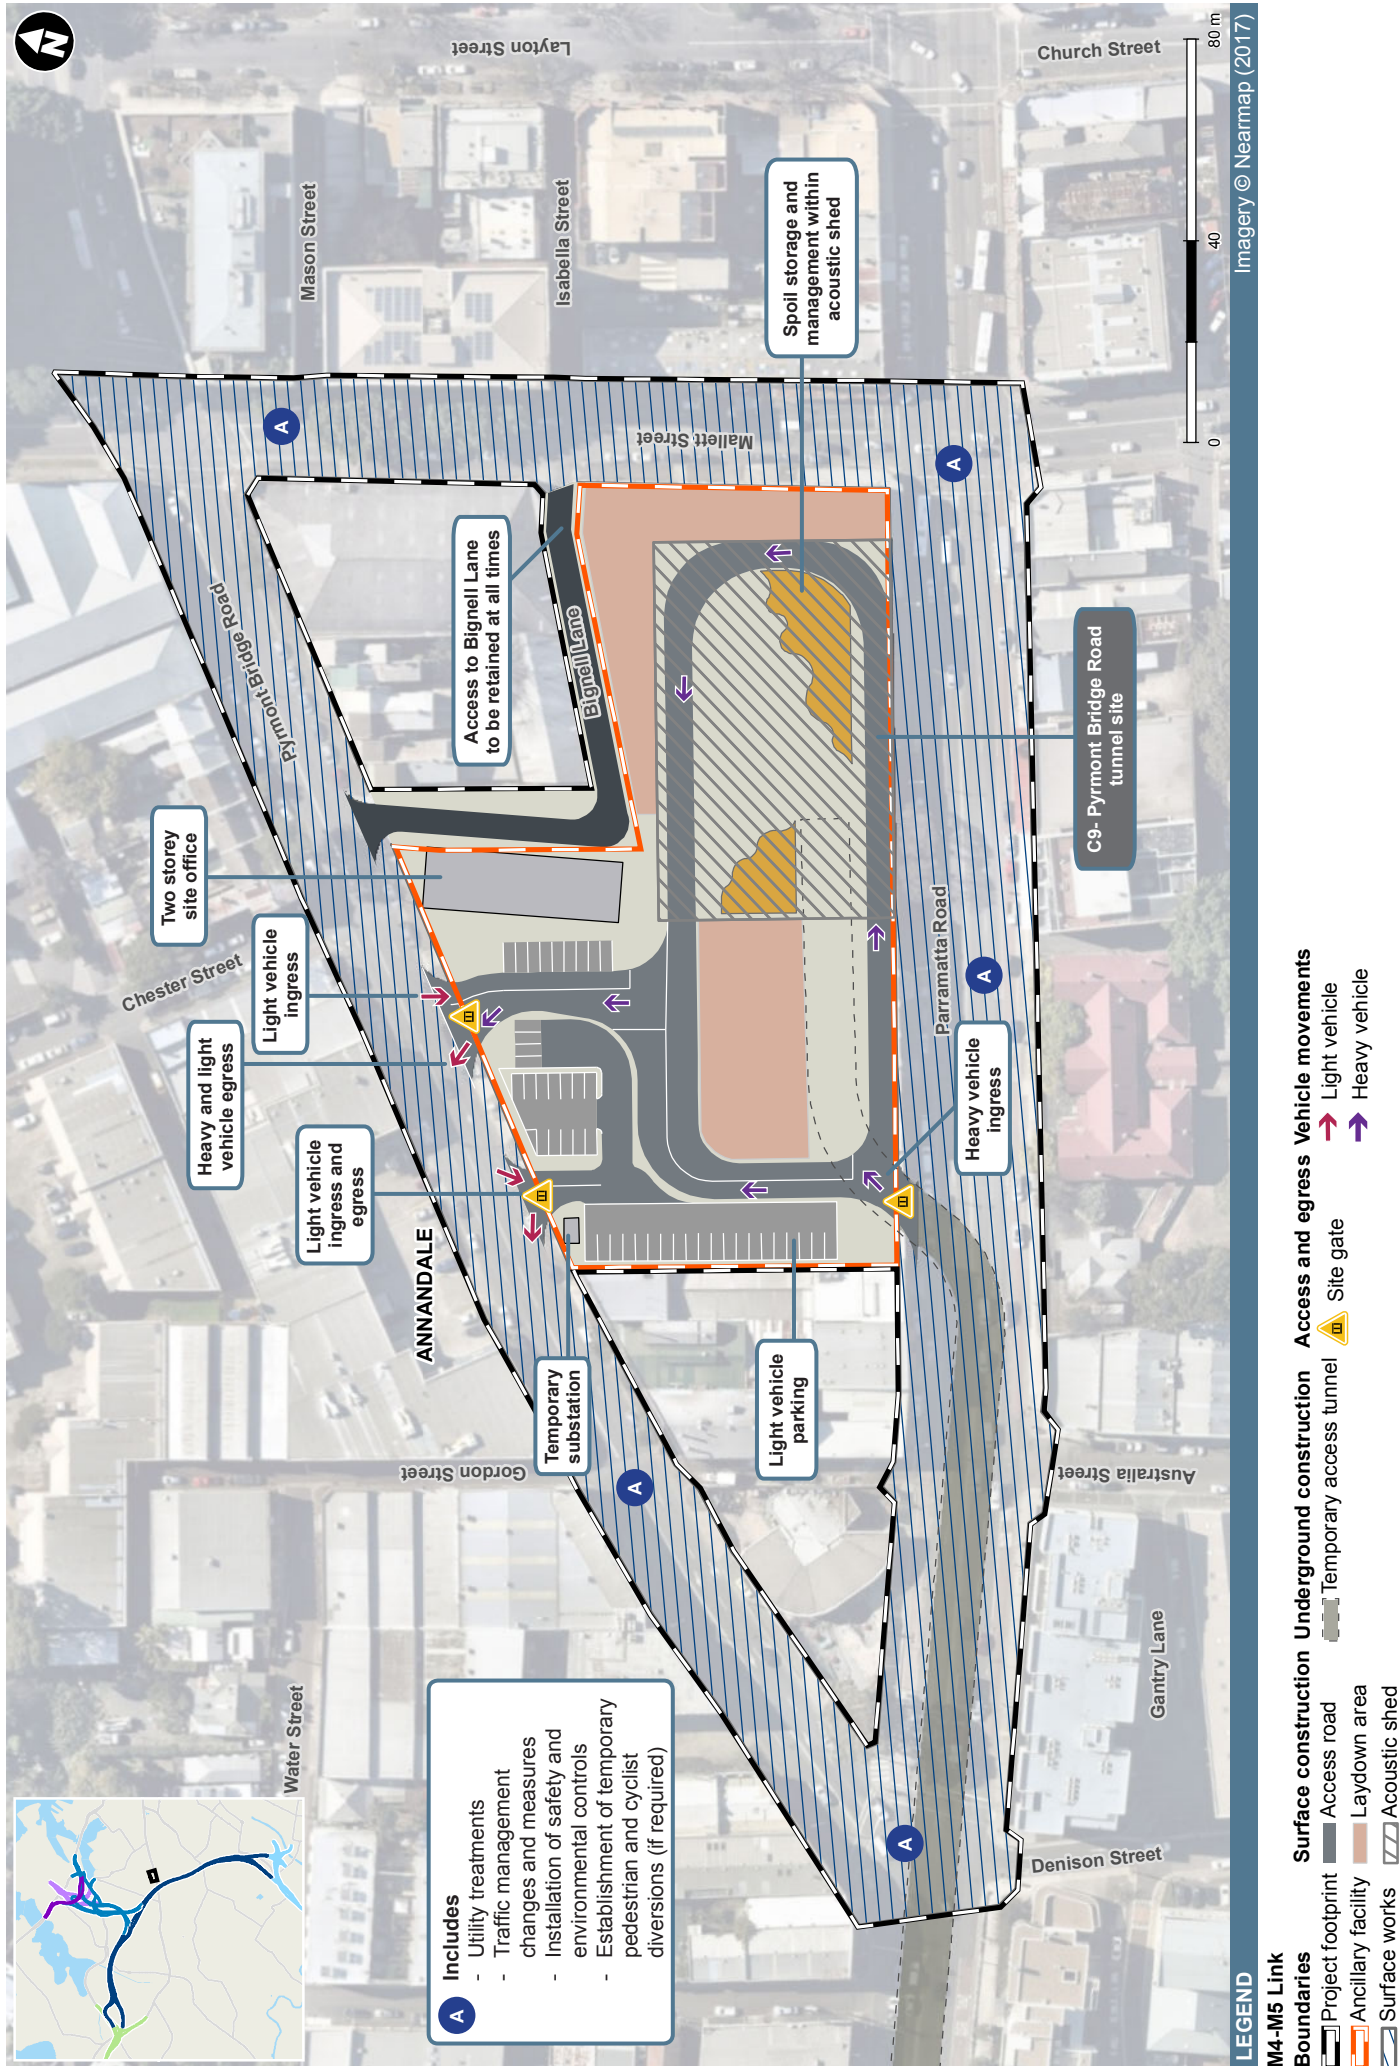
Indicative Pyrmont Bridge Road tunnel site (C9) layout
